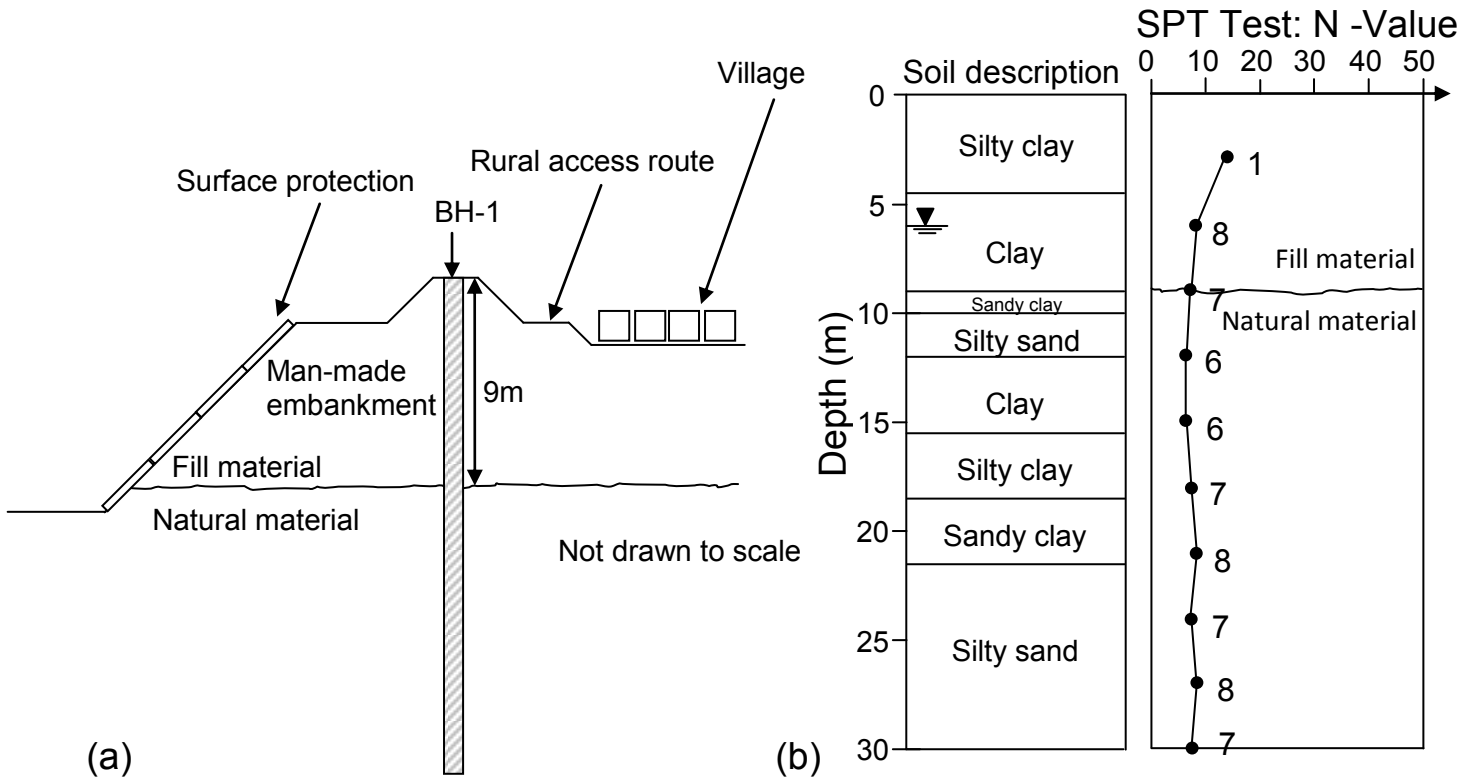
Man-made embankment at Kedungharjo (a) cross-section of embankment and (b) SPT profile.
